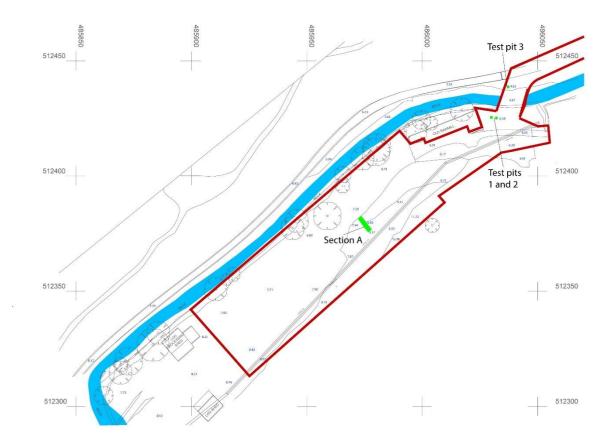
Site plan with the location of Section A and the three Test Pits indicated in green.
